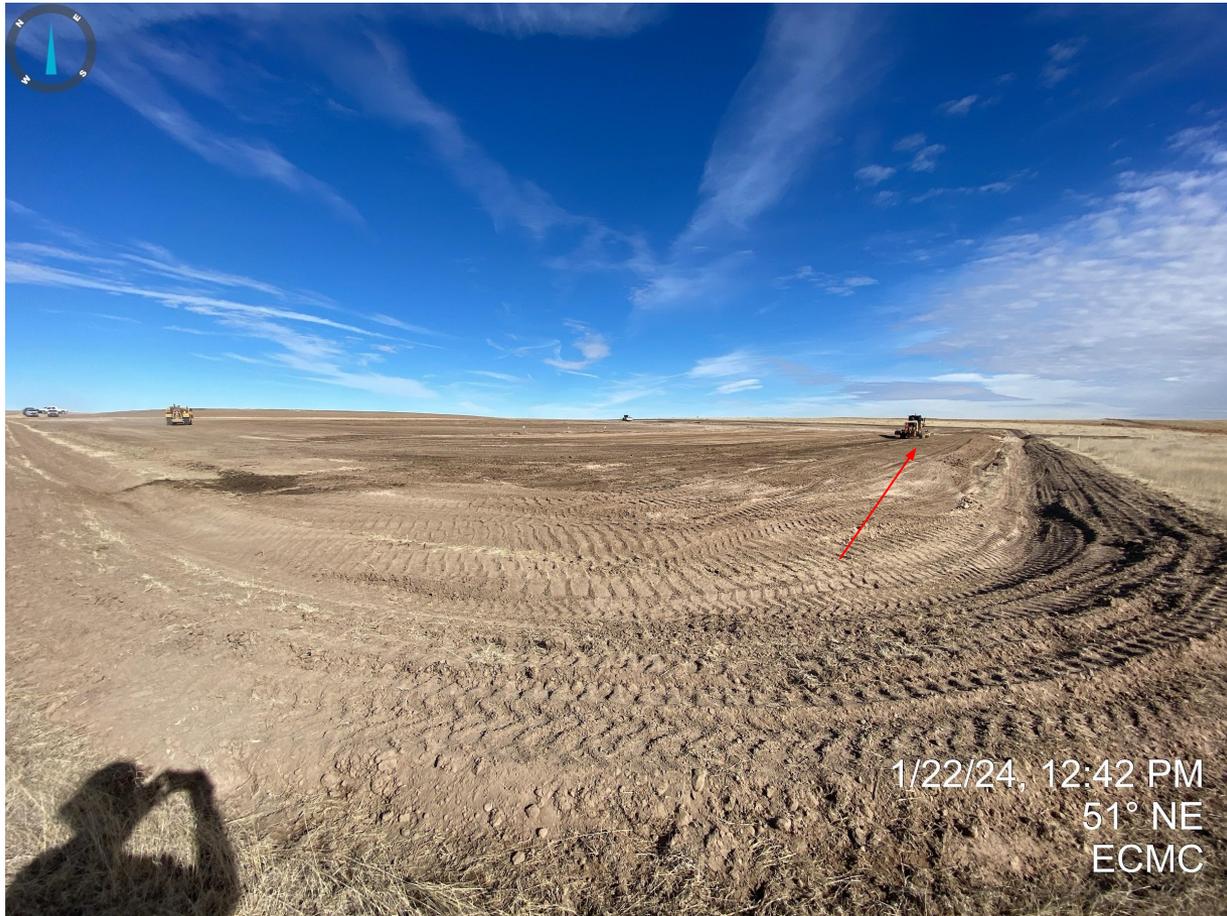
Taken from the southwest corner of the location. Perimeter ditch and berm has been constructed around the construction area. Crews were observed to be building a stormwater detention area (background of photo with red arrow).
